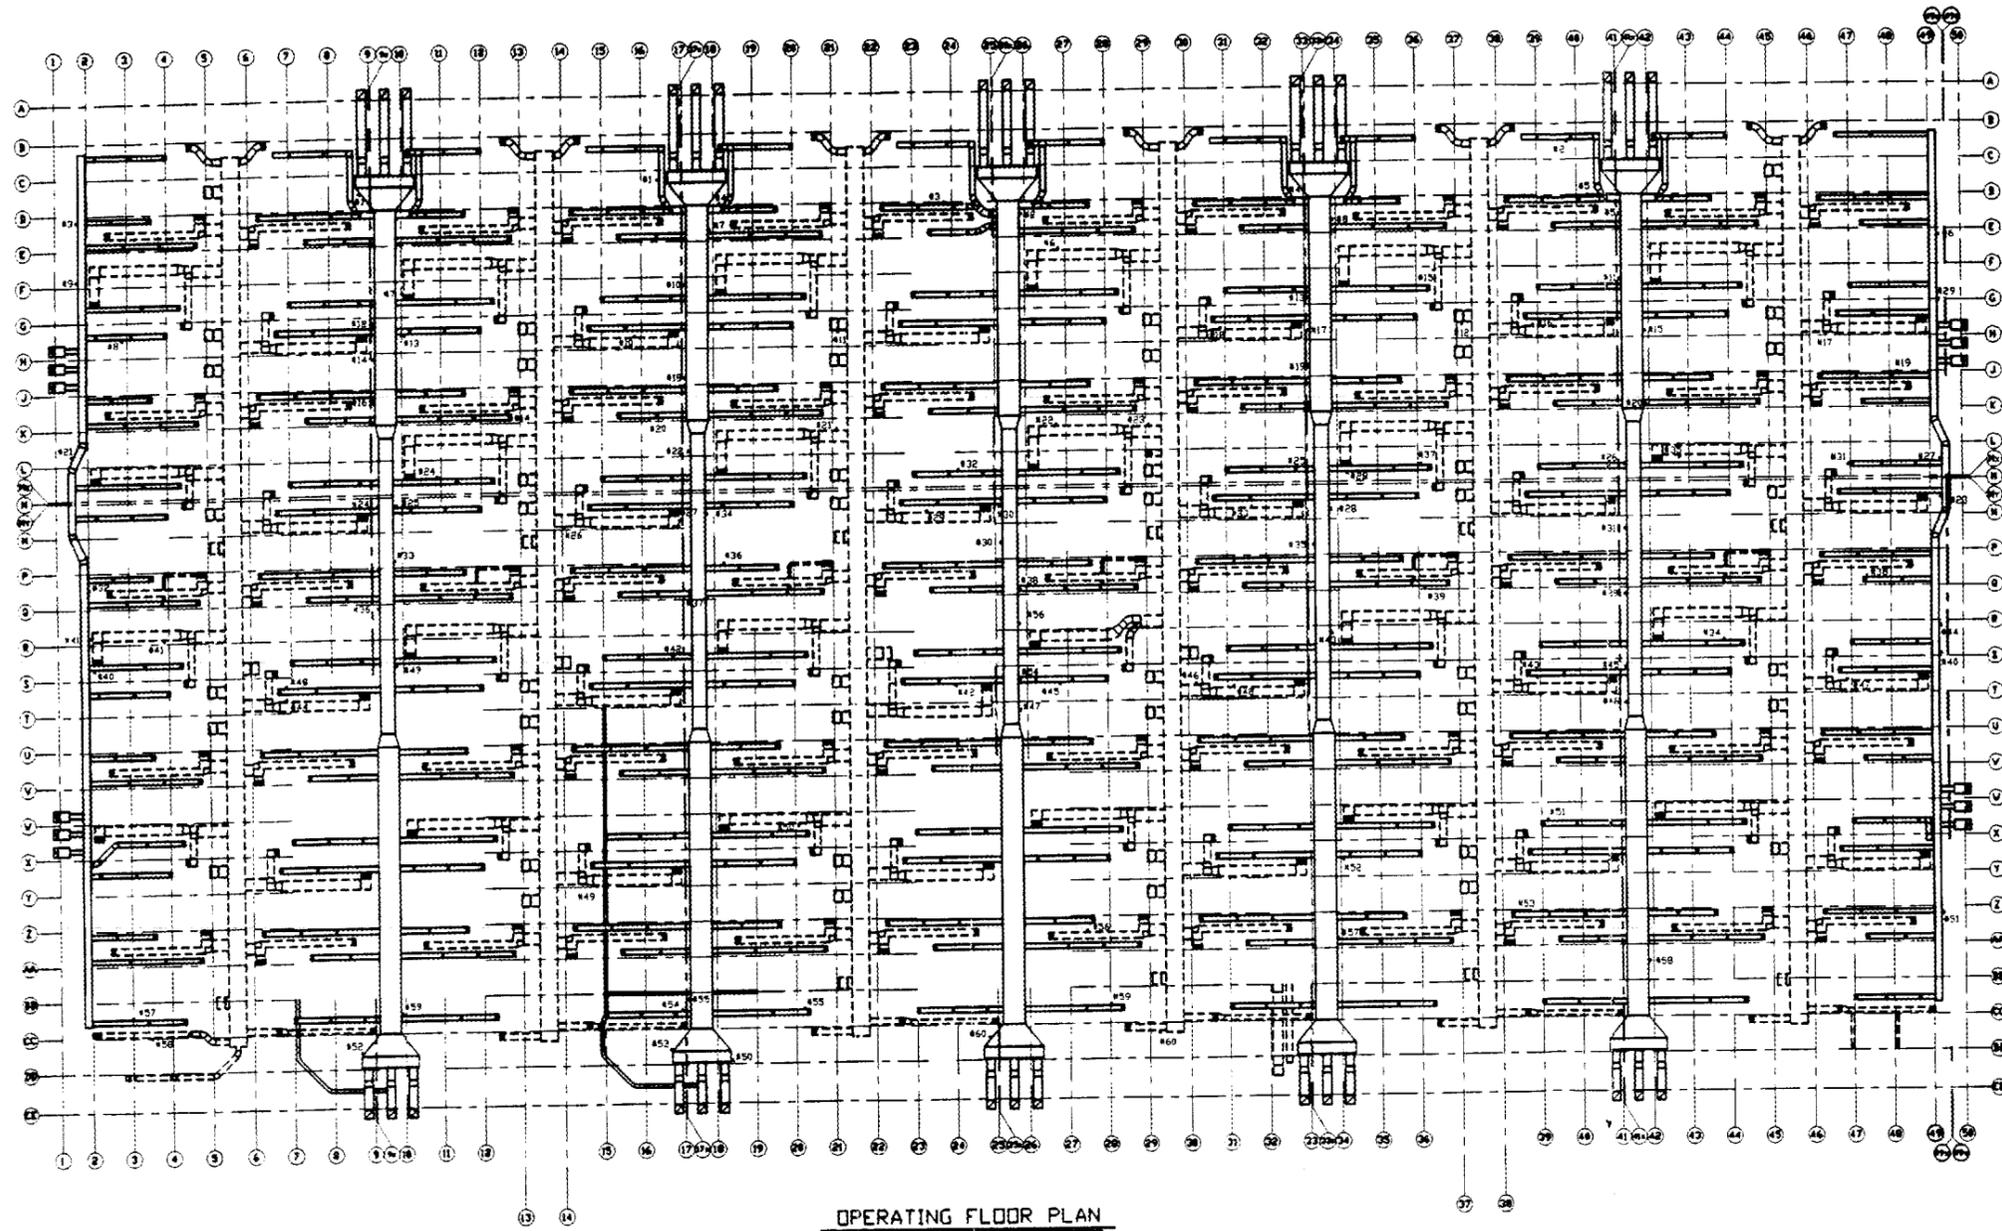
Layout of main plenums and side laterals in Building K-31, showing column numbers and sampling locations.
